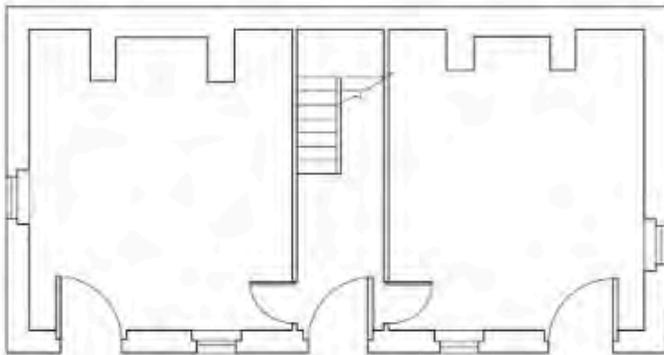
First floor plan of the kitchen house found at 10 Judith Street (drawing by author).
